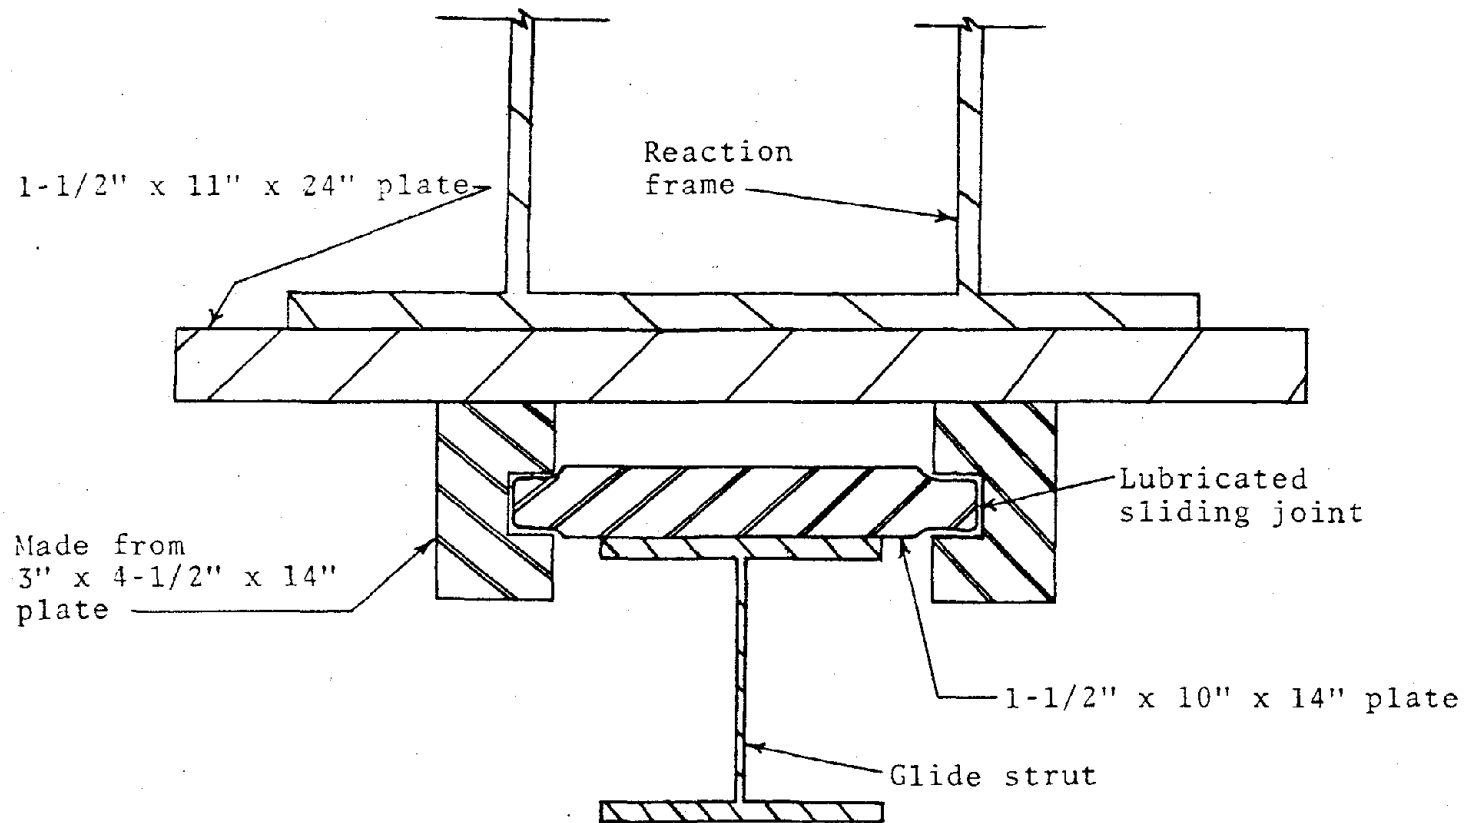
Detail showing lubricated glide assembly; Section A-A in Fig. 4.3.1
